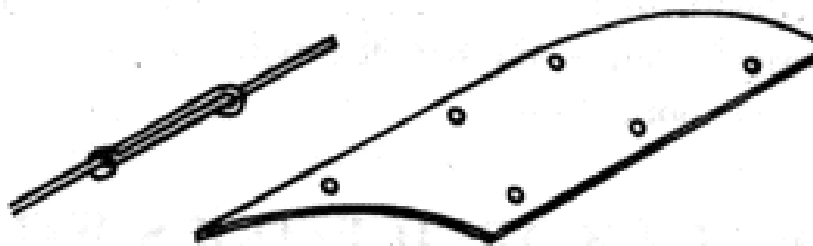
Centering (Mould of Jack Arch roofs)
